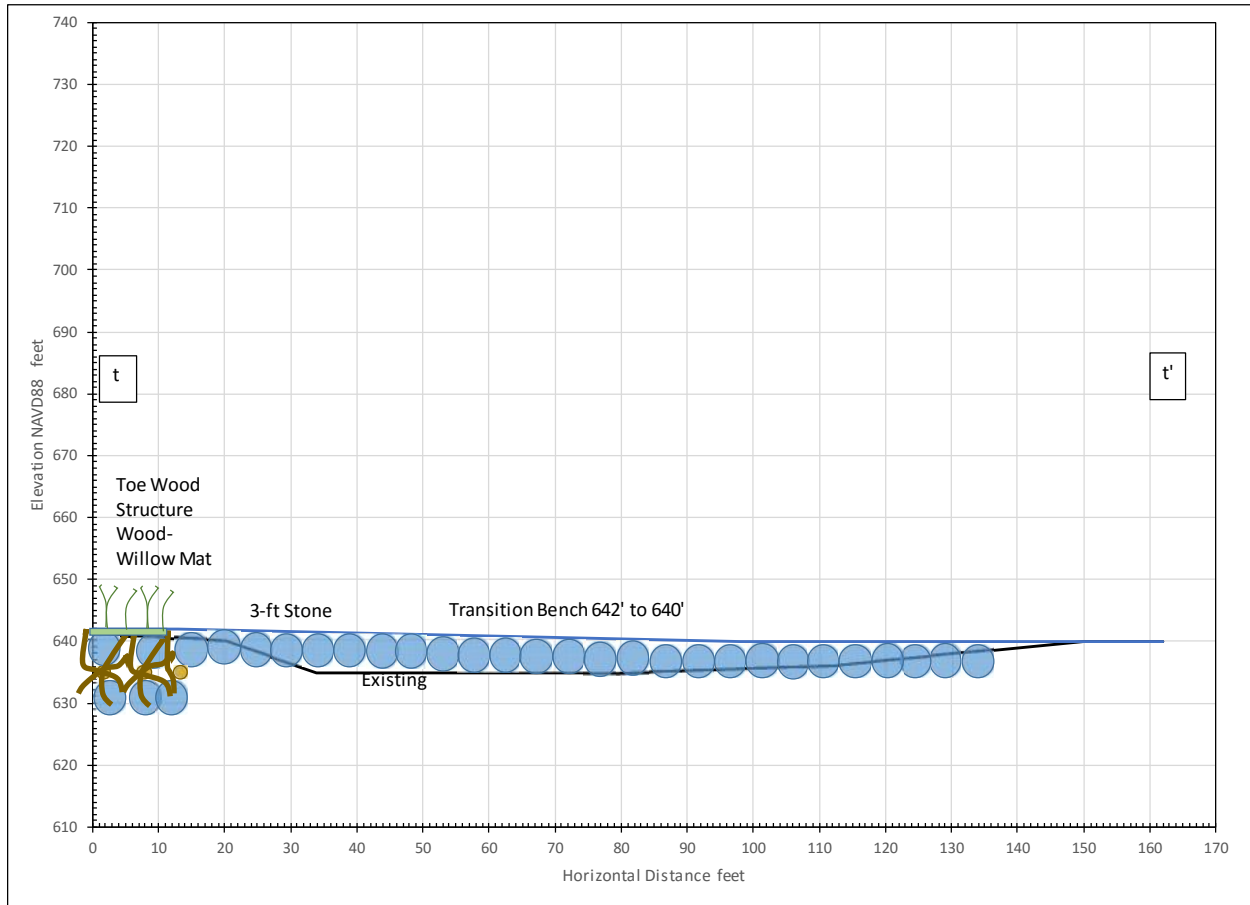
The transition bench elevation joins the toewood bench at an elevation of 643 feet then slopes downward to an elevation 640 feet near the west bridge abutment.
